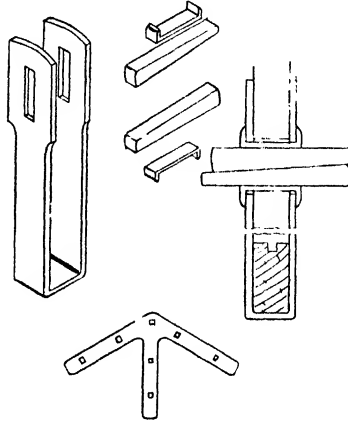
Showing Metal Parts in the Gib and Cotter Joint.
